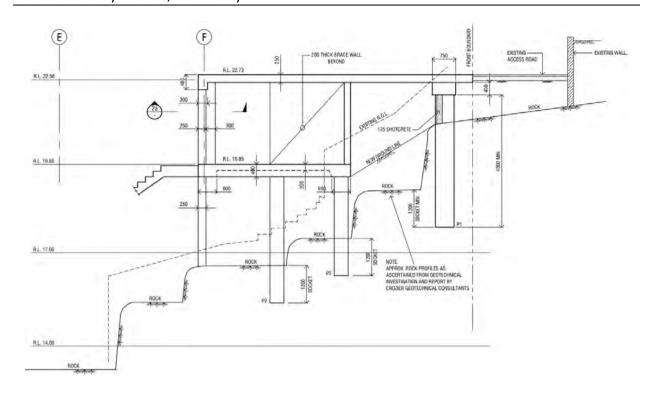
Footings and slab section 2 (Entry level RL22.73 and upper level RL19.85)
